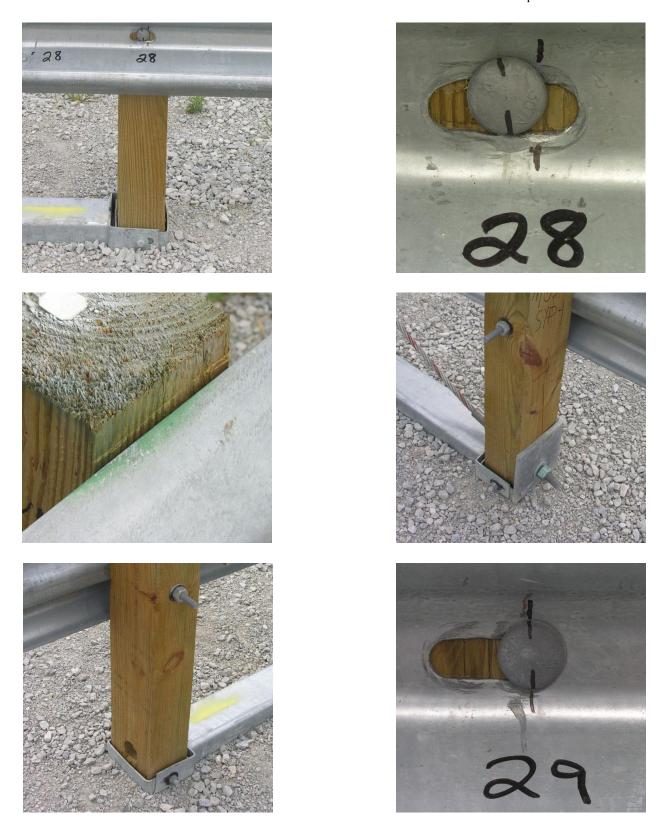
Downstream Anchor Damage, Test No. MGSSYP-1
